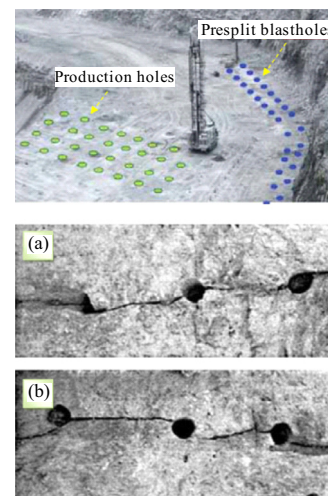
Fracture patterns in the presplitting blast method (a) location of presplit holes and production holes; (b) final fracture plane after presplit blast [21].
